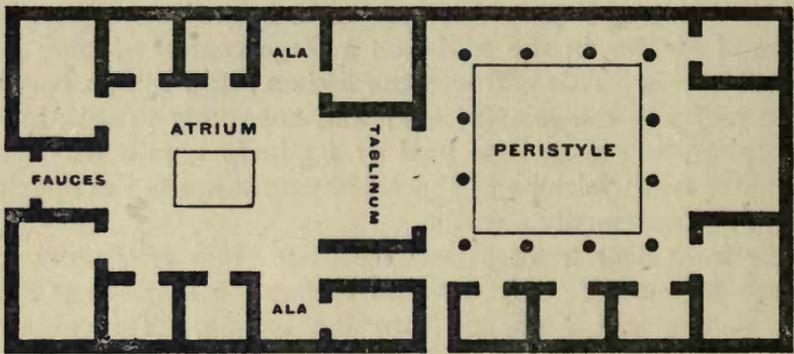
Typical Plan of Pompeian House. (After Mau.)
